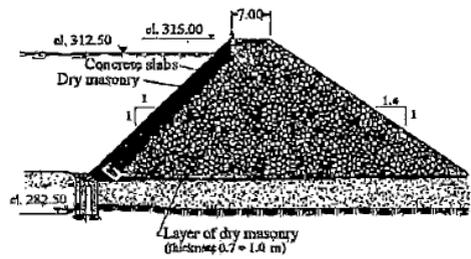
General cross section of Contrada Sabetta Dam (modified after Cazzuffi 1987 and ICOLD 1991).
